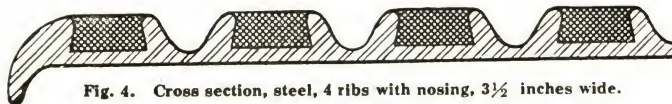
Cross section, steel, 4 ribs with nosing, 3½ inches wide.
